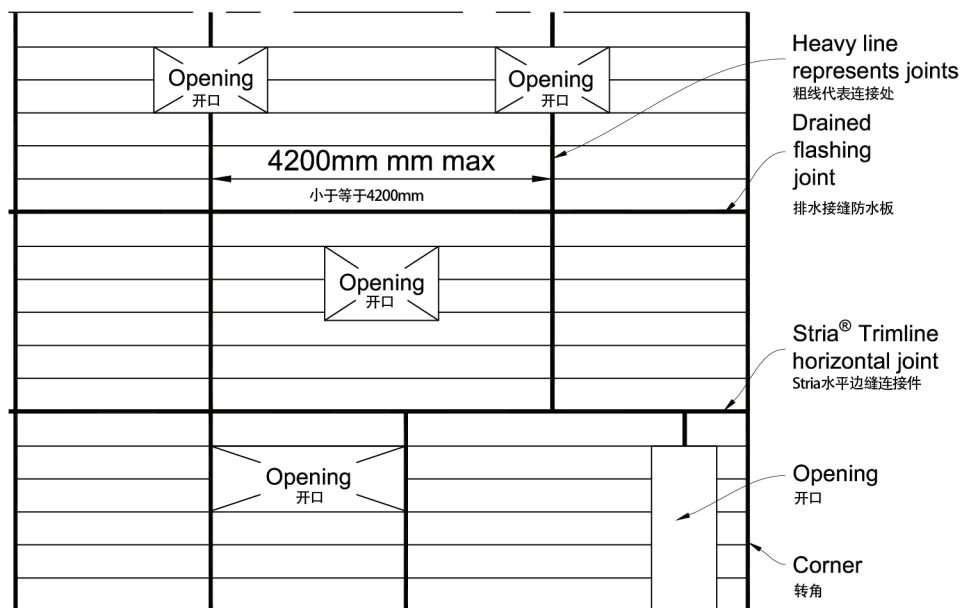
Stria Cladding layout 图3: Stria外墙板布局图
